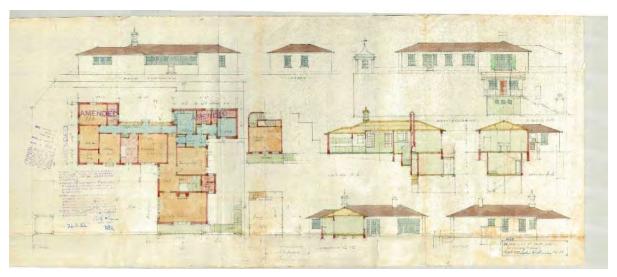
Architectural plans of 69 Wentworth Street, Point Piper from BA265/1955 (Source: Woollahra Records)
